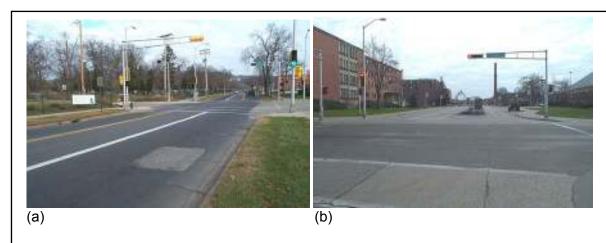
Flooding Location at East Avenue/La Crosse Street Intersection
